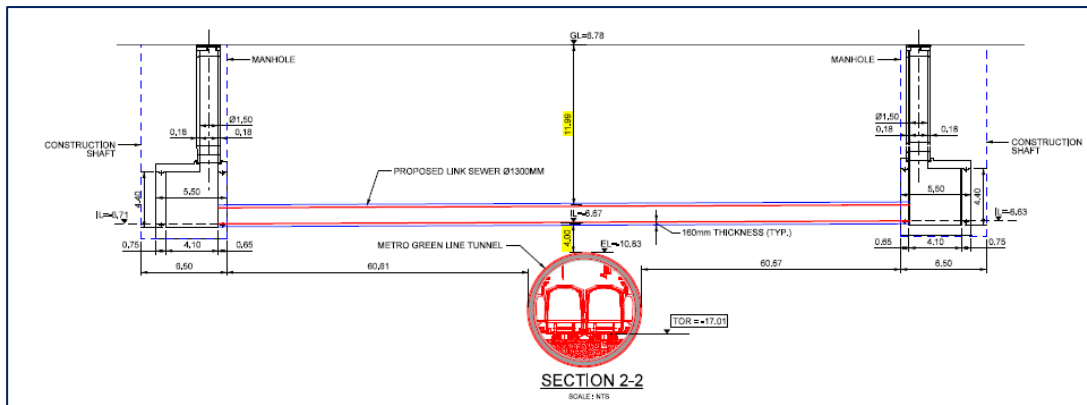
Section for NDRC interfaced with Railway Tunnel
